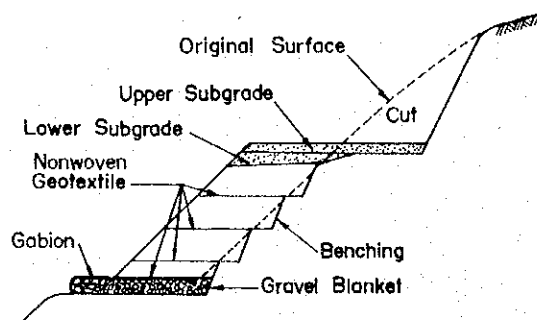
Cut and Fill Section with Nonwoven Geotextile
